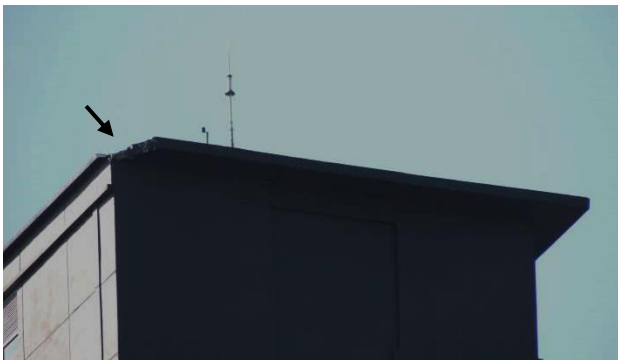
A bypass on one corner of the roof of the elevator motor room near an ESE air terminal. Another bypass had occurred earlier at one of the distant corners of the same building.
